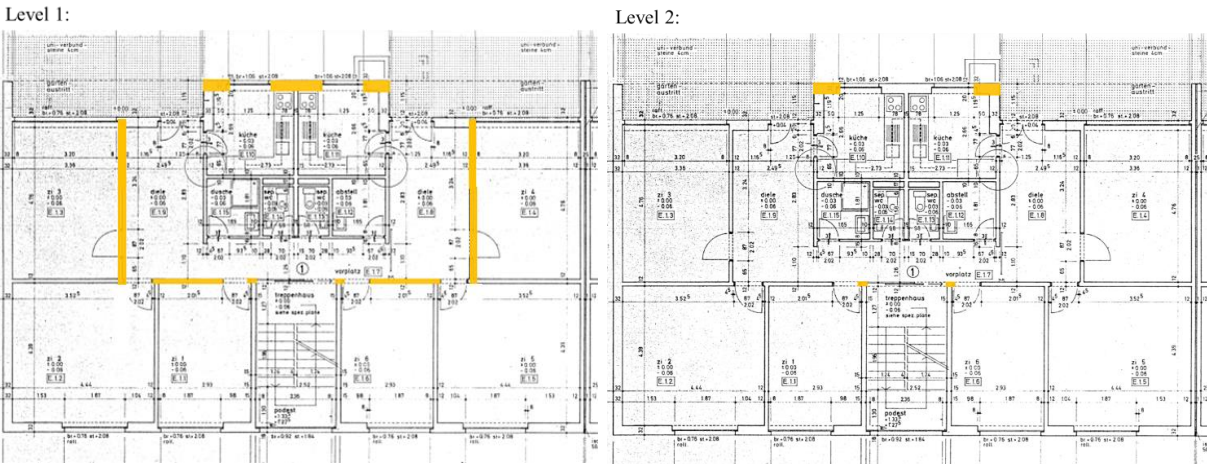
Walls of planned optimised seismic retrofit (54.2 m², NSM steel reinforcement)
